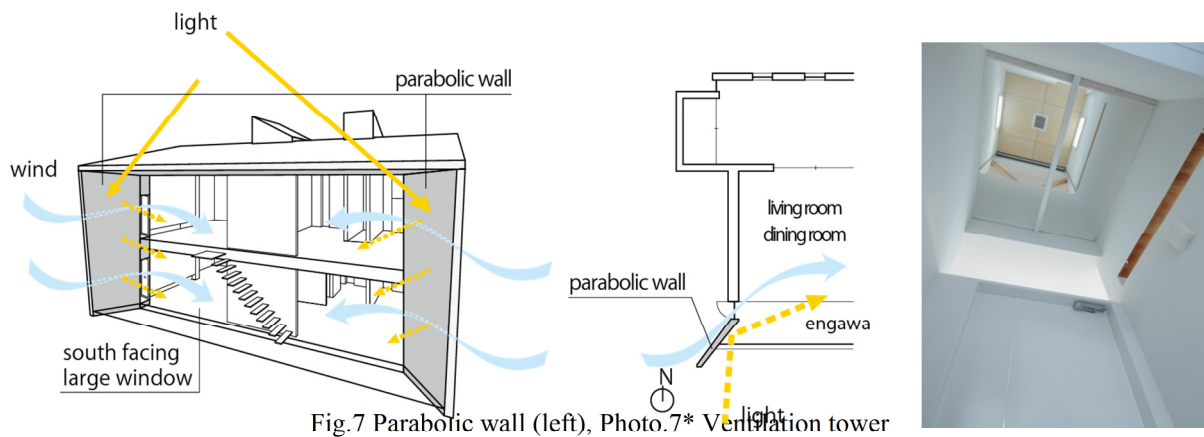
Parabolic wall (left), Photo.7* Ventilation tower
